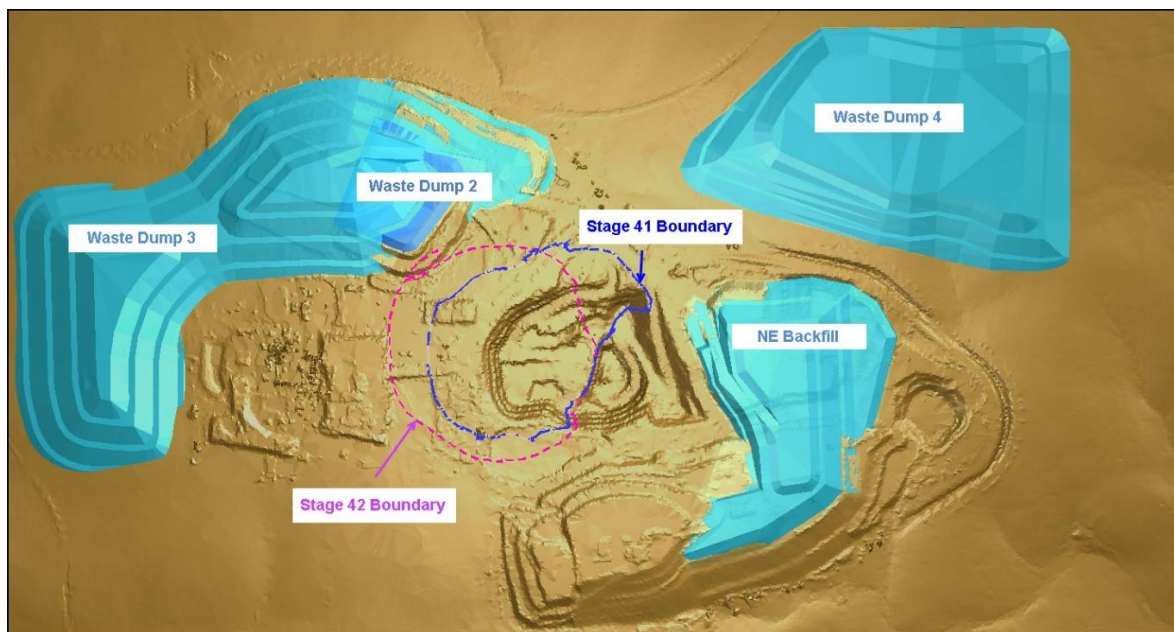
Pit Design Outlines and Waste Dump Locations
